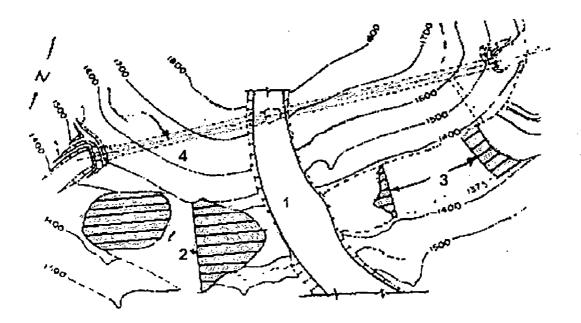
New Bullards bar dam - Layout of diversion tunnel and cofferdams
